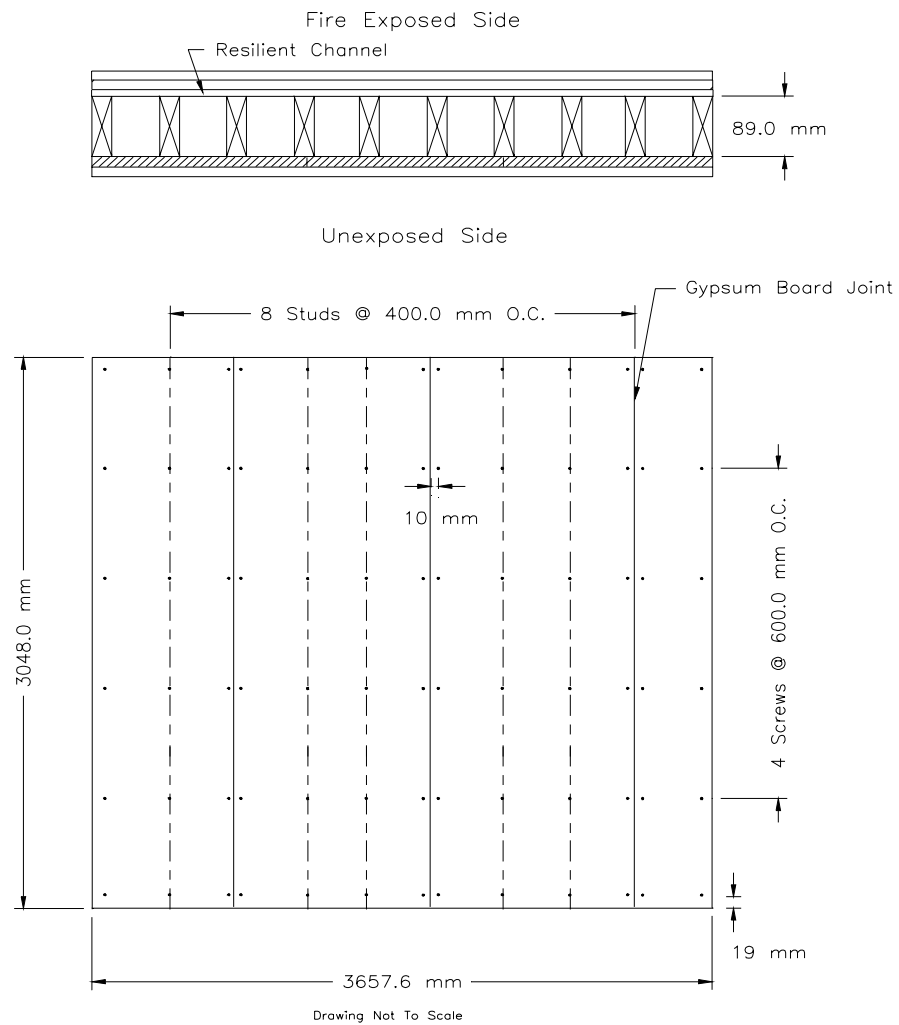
Screw Locations For Wood Stud, 2x2 Gypsum Board Layers, Full-Scale Assembly, Resilient Channel on Exposed Side (Base Layer Unexposed Side)
